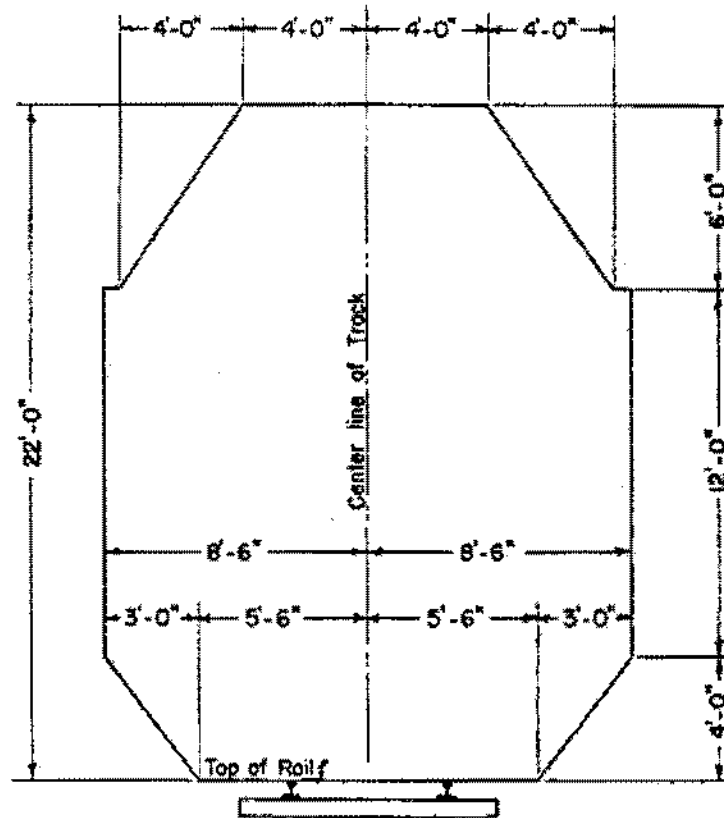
General Clearance Diagram for Structures Other than Bridges, Buildings, Platforms, Retainers and Guards.
